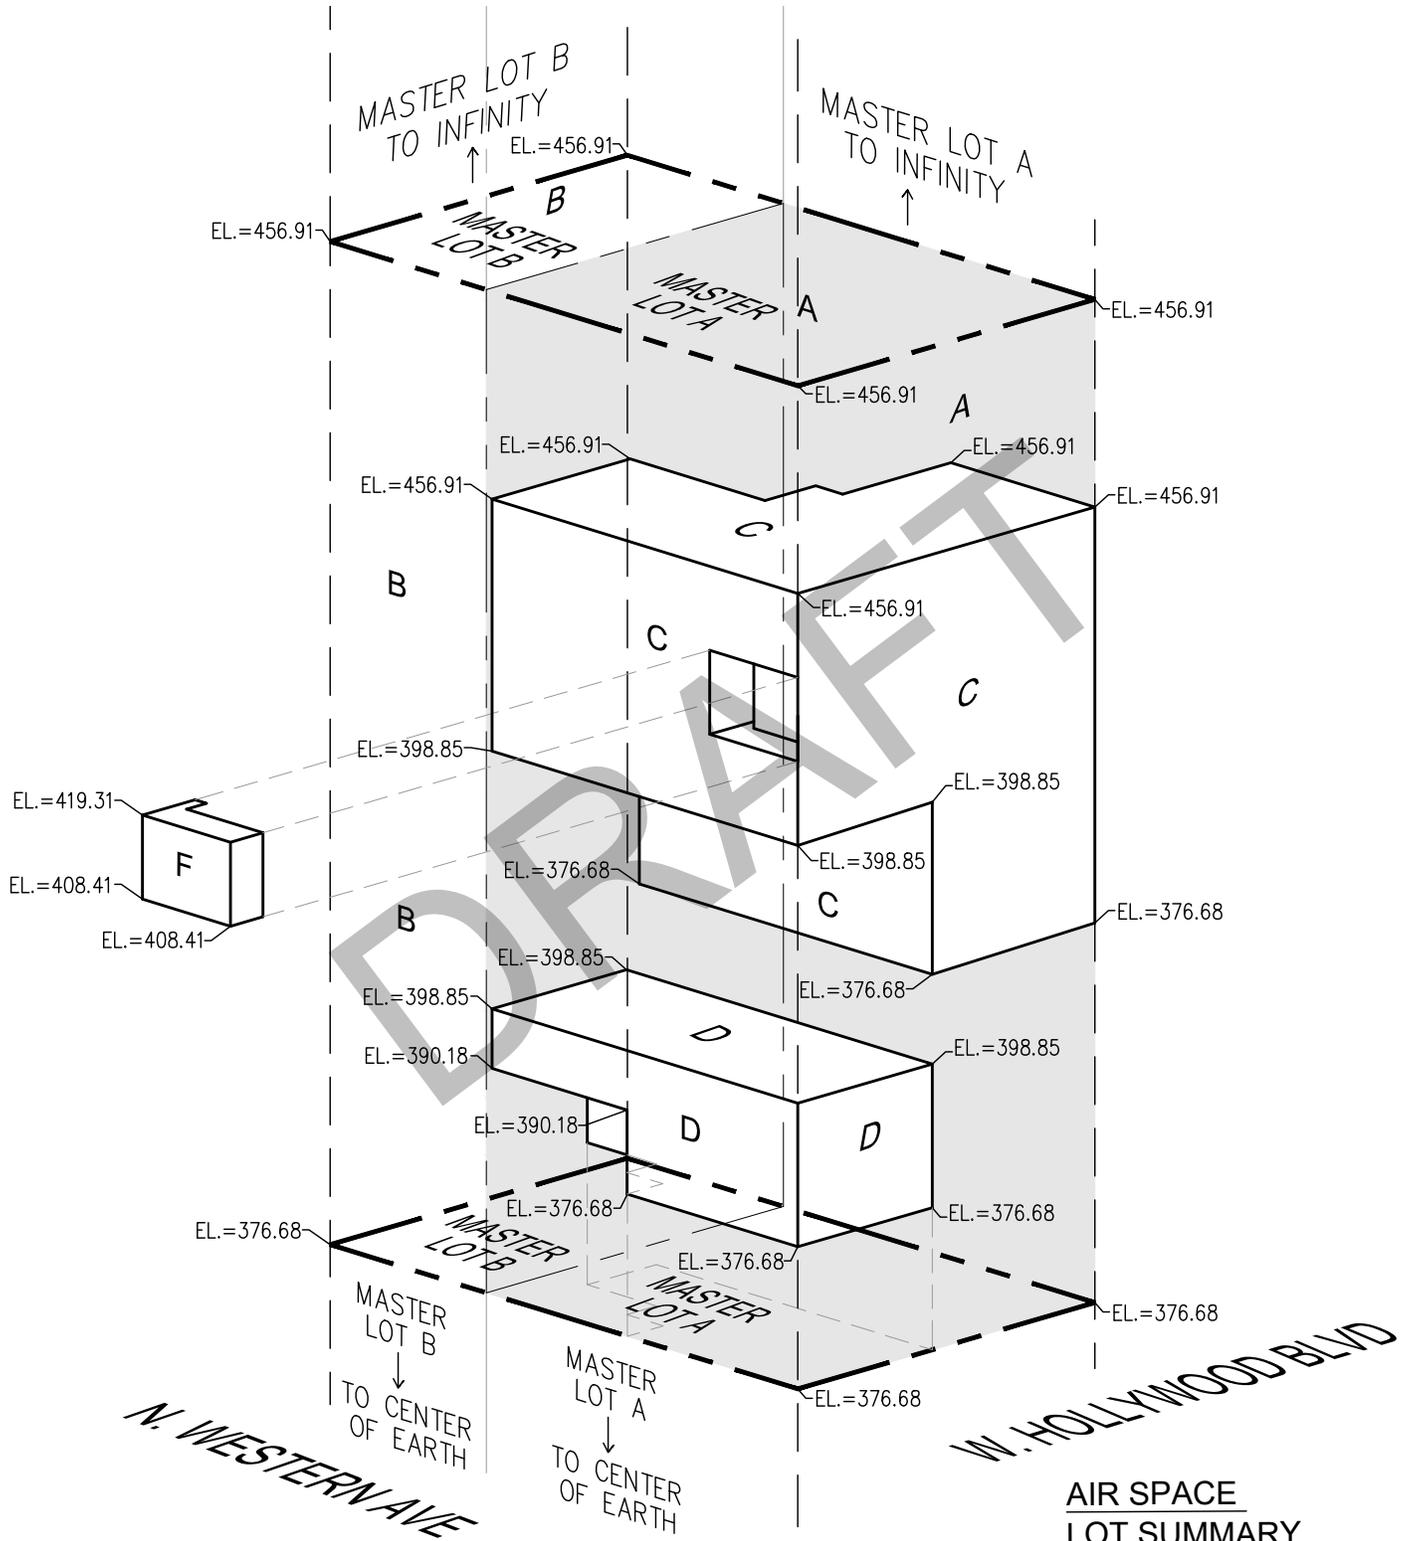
EXHIBIT AIR SPACE LOTS (BRICKER BUILDING) - SECTION VIEW
